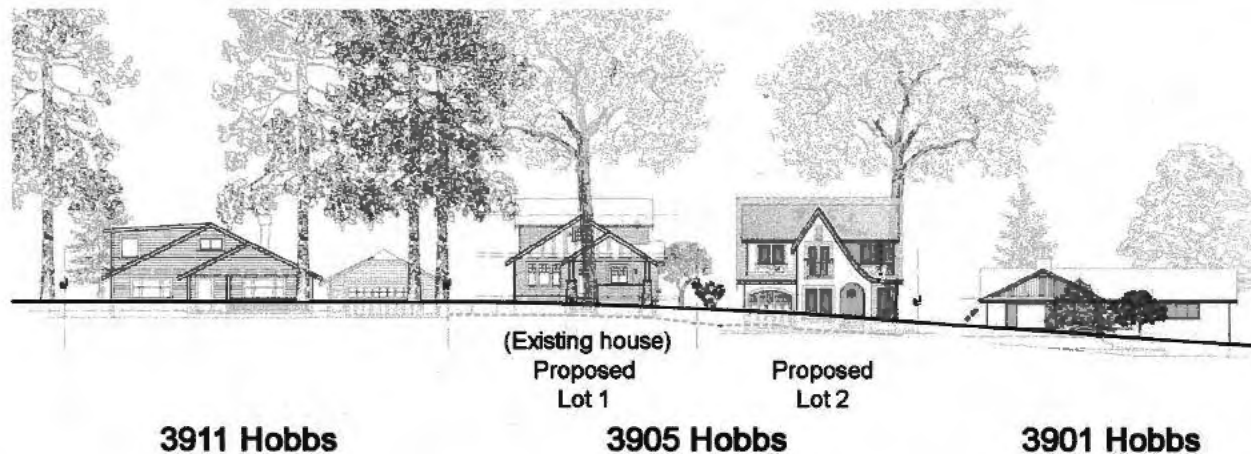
Streetscape Elevation showing Proposed Dwellings (from plans by Zebra Design)
